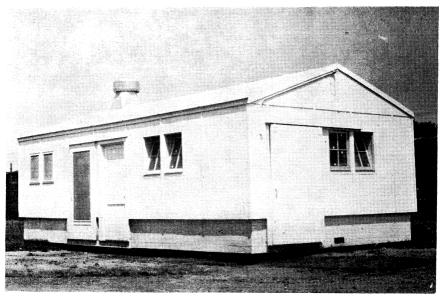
Portable Grade A milking barn at construction site in Sapulpa, Oklahoma. Cows enter through doorway at end of building. The milk handling room is at the far end of the building. The roof and the upper walls are covered with exterior type fir plywood.
